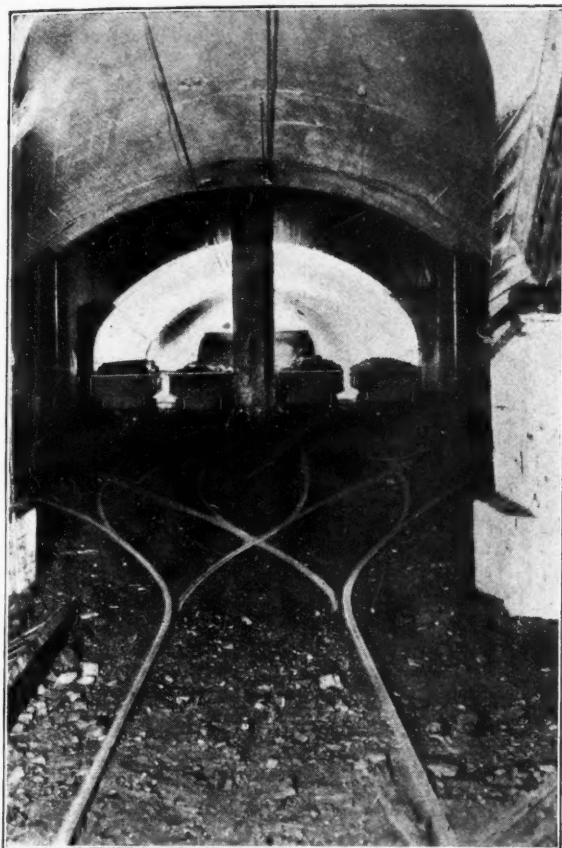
EMPTY SIDE OF SHAFT BOTTOM.
